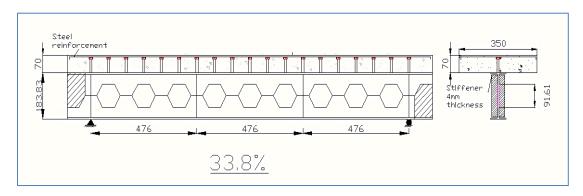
Plan of Composite Castellated Beam (λ=33.8%)
